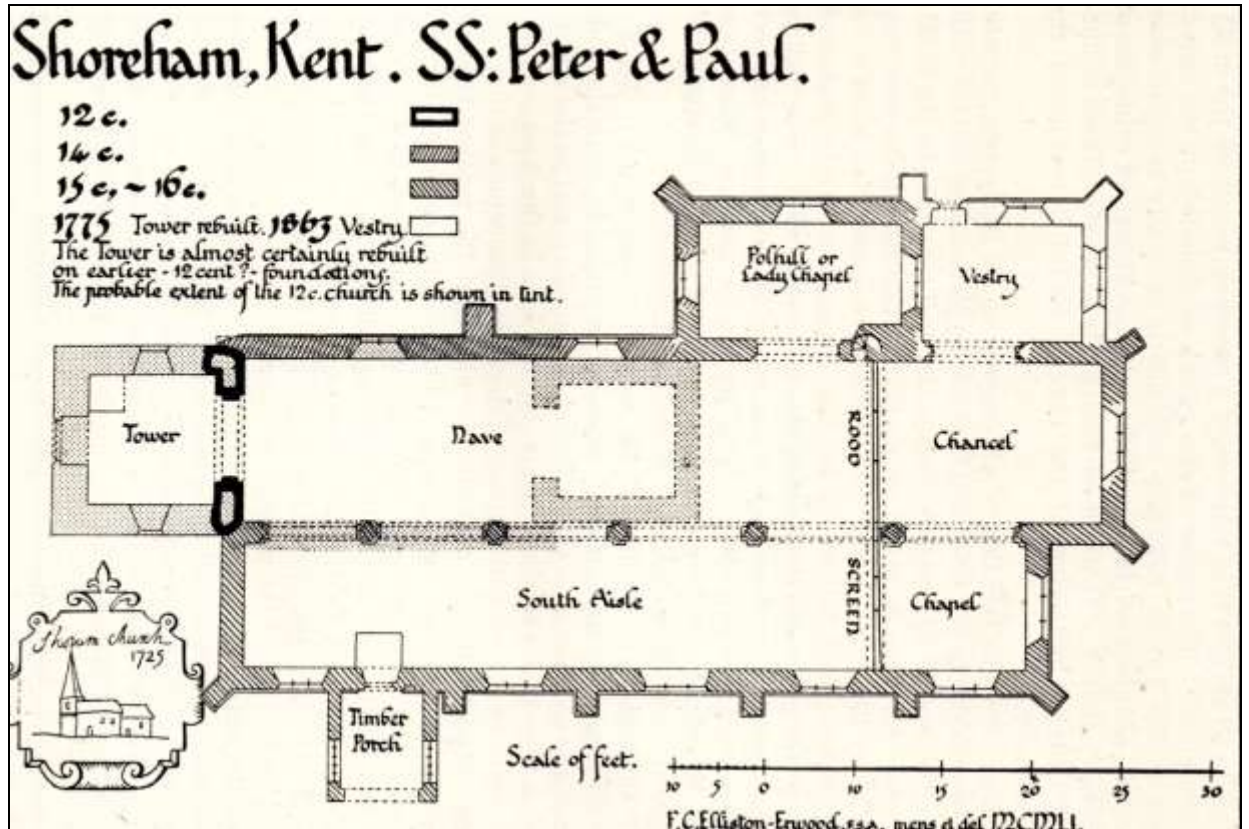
Plan of the church showing Elliston-Erwoods proposed phases (Arch Cant 1952)
